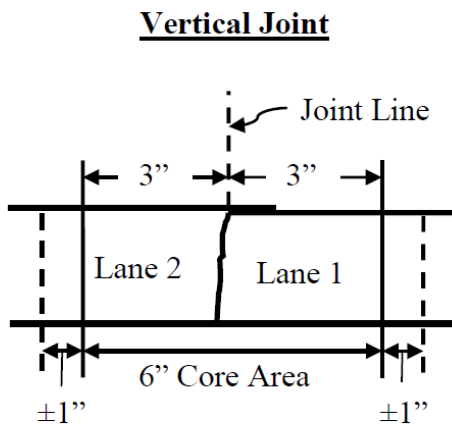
Cross-sectional View, Position of Core Along Longitudinal Joint
